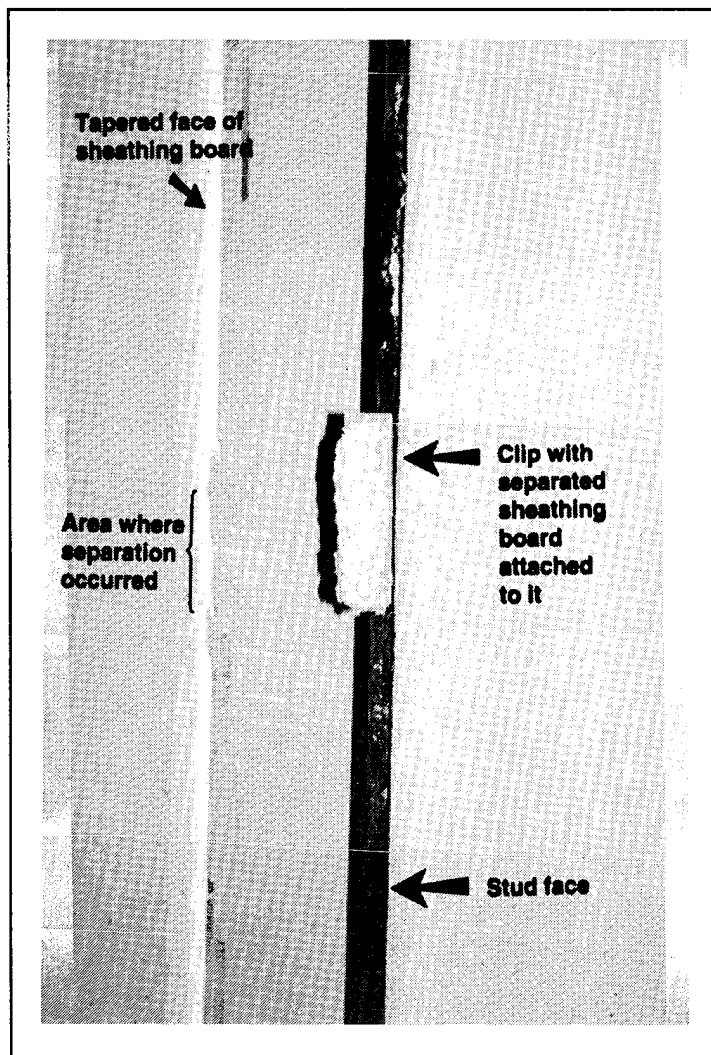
Location of board cracked during installation of the pronged plate and subsequent separation of the cracked piece during installation of the board to the stud assembly.
